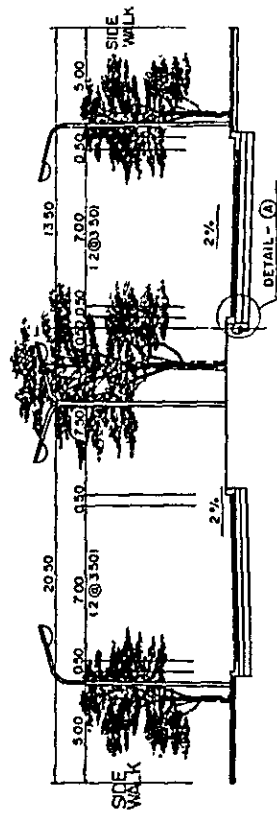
Typical Cross Section of Tg. Priok Access (2)
